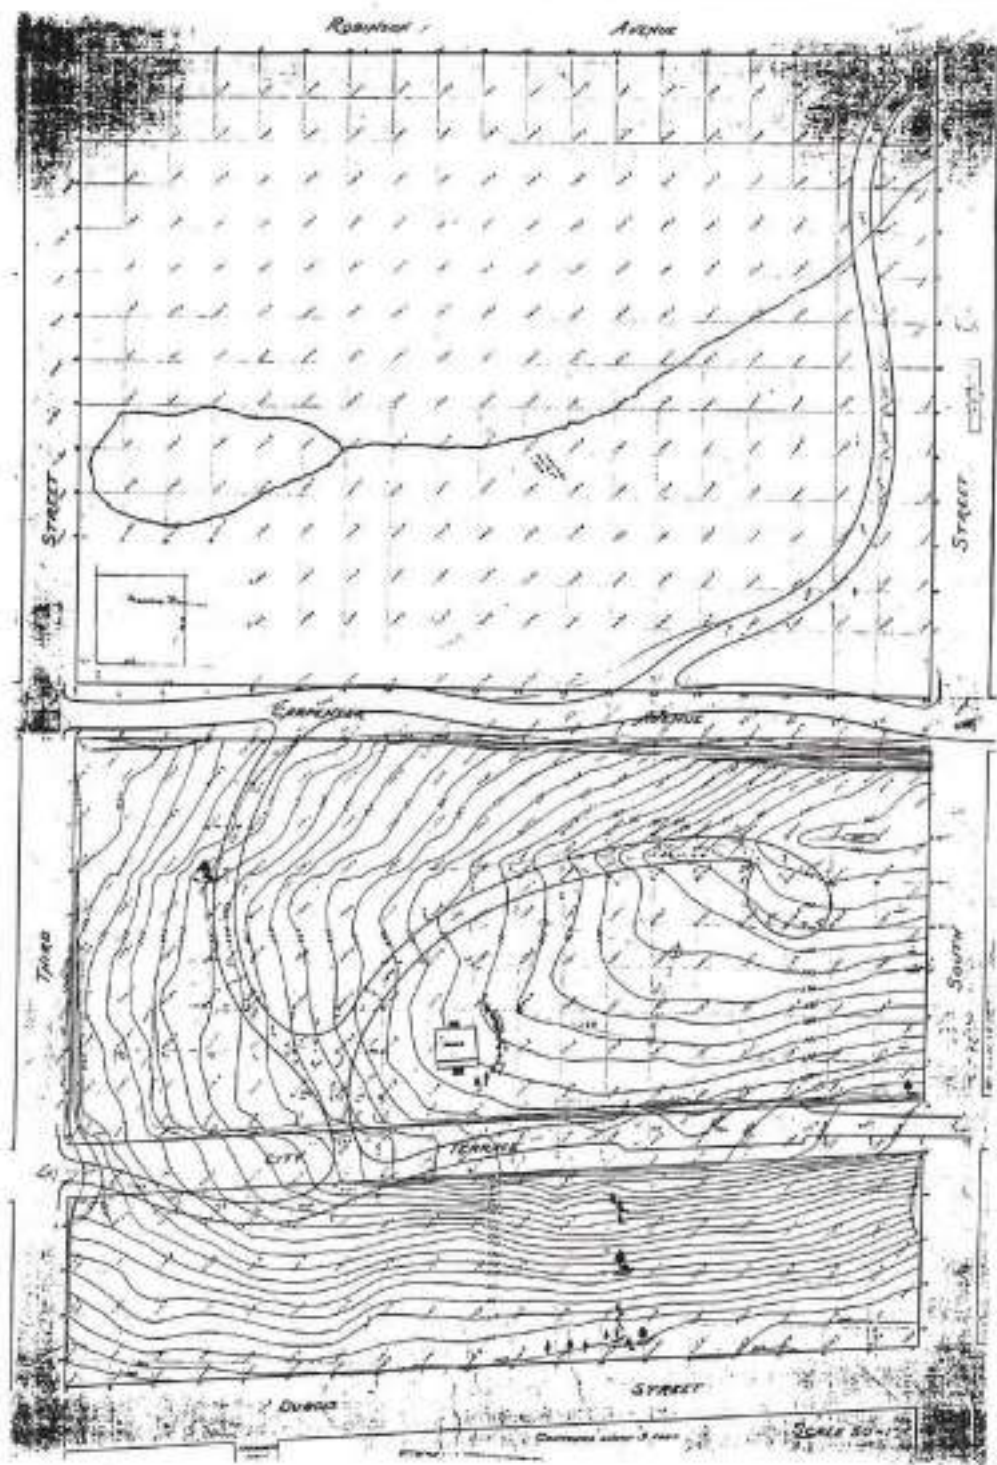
Park drawing shows a refined plan for the upper park, with grided elevations drawn in black, blue and red ink. Untitled and undated. Lettering and drawing style is similar to others by Calvert Vaux and Samuel Parsons. Pond and stream outline in lower park were darkened for better visibility by LANDSCAPES. CoN
